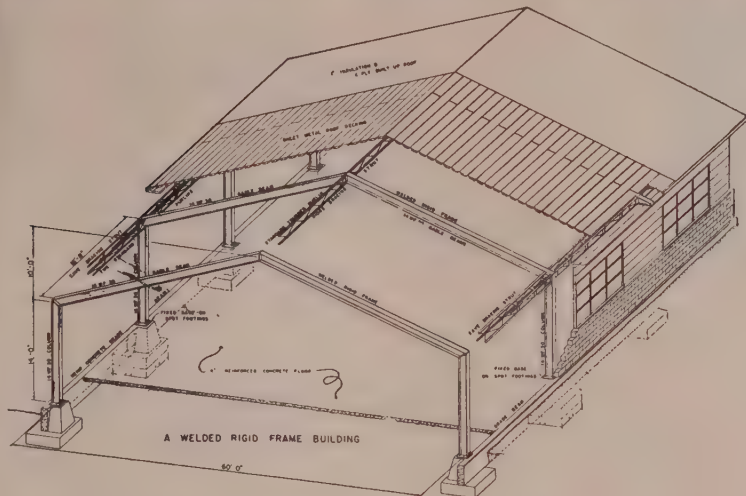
Welded Frame Building *uses longitudinal rigidity of roof by running welded roof decking lengthwise.
